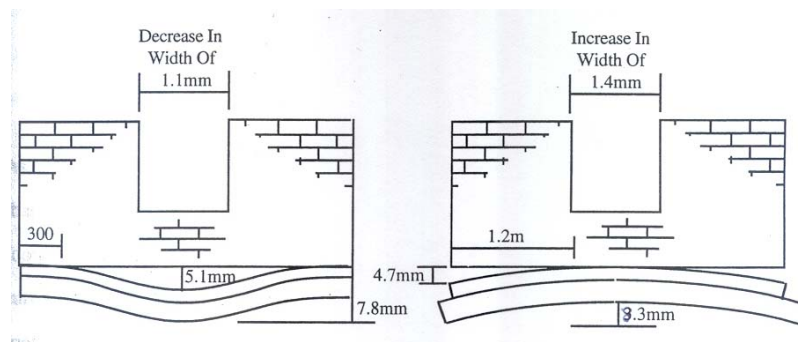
Experimental behaviour of masonry walls under foundation movements (Bryant 1993)
